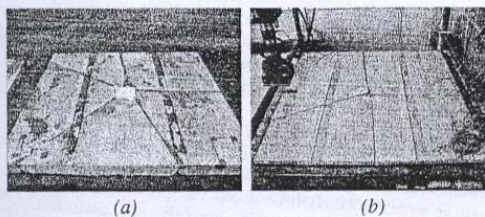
Failure cracking pattern for: (a) concrete slab reinforced with 0.32% of synthetic fibers; and (b) plain concrete slab.
